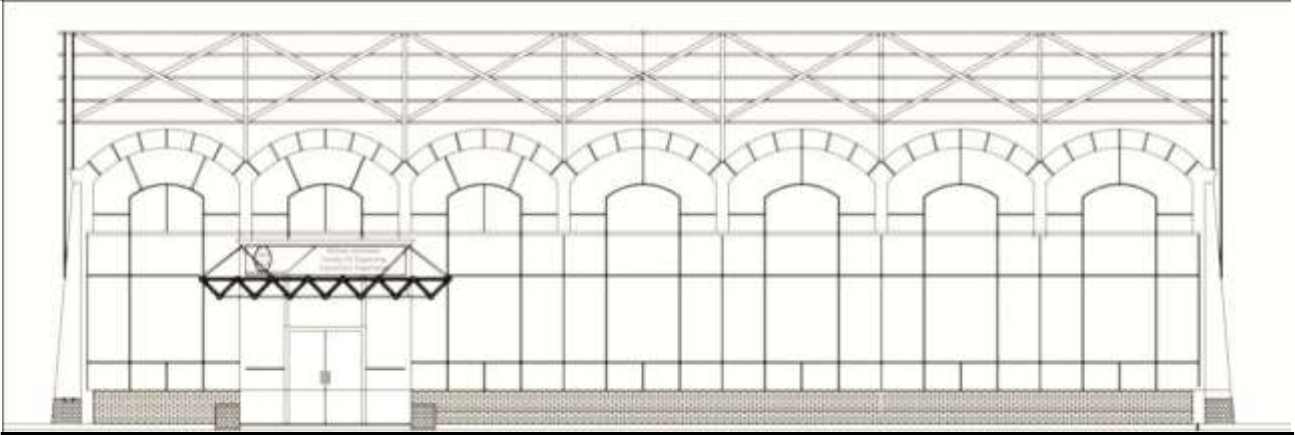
shows the elevated PV panels structure in the biofuel building's main elevation
